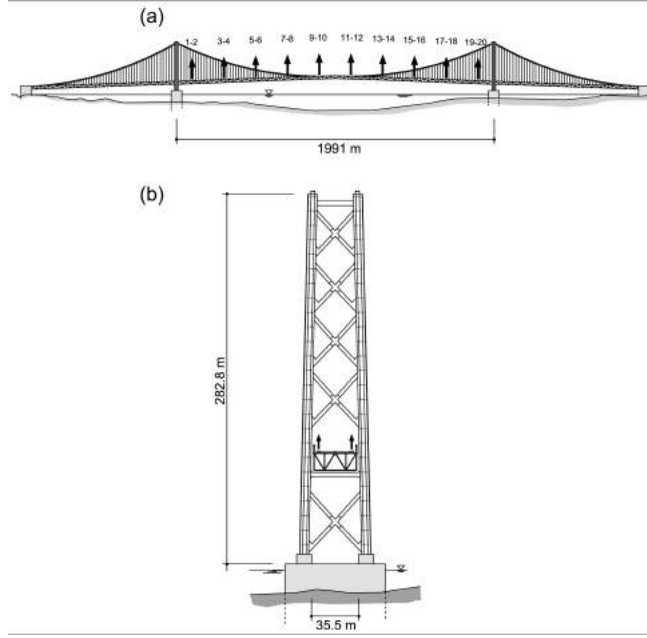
Case study bridge (AKB) with ideal sensors' layout: cross section (a) and elevation (b).
